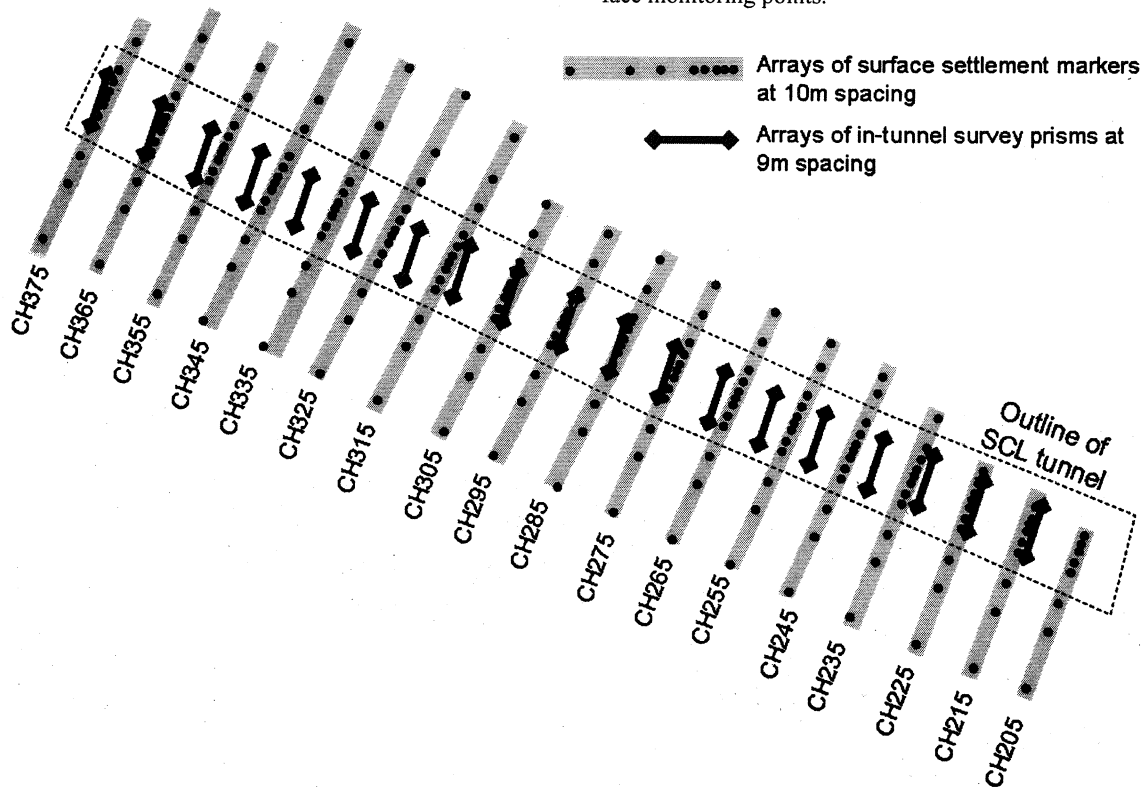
Schematic layout of surface settlement arrays and in-tunnel survey prisms
